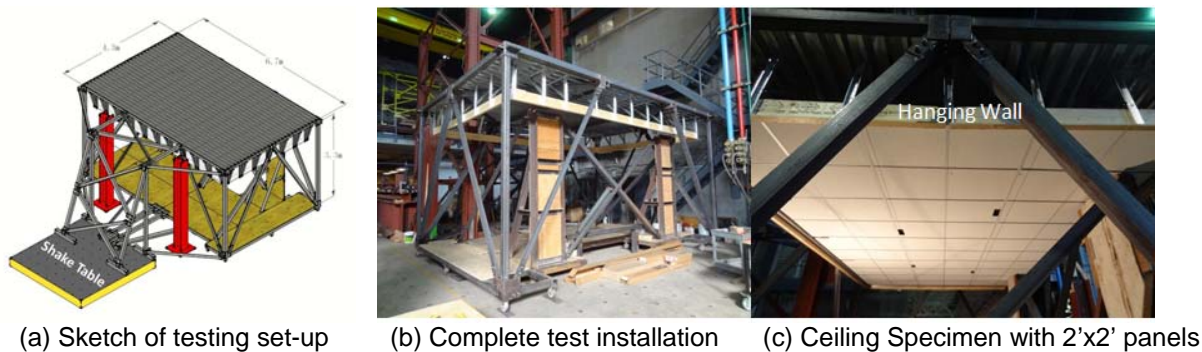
Testing Platform and Hanging Wall with Ceiling Specimen
